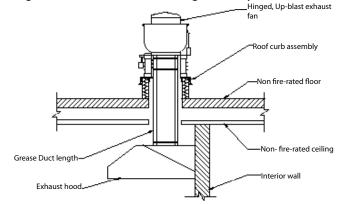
typical Grease Duct enclosure for one story buildong without fire-rated roof ceiling assembly
